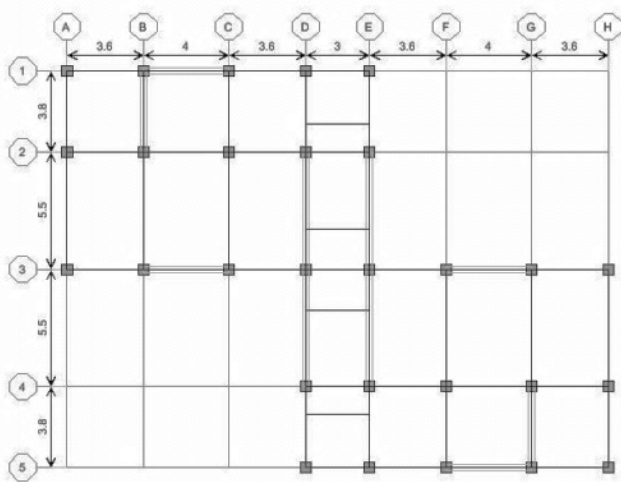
Eleventh to fifteenth Floor Plan (ST 11 to 15)
